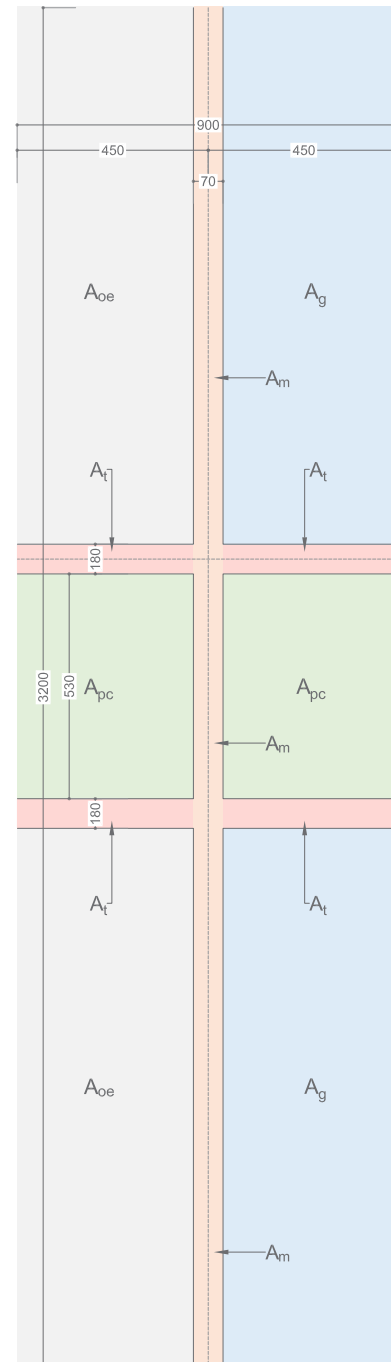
Enlarged elevation view showing surface areas of typical curtain walls (Source – Author)
